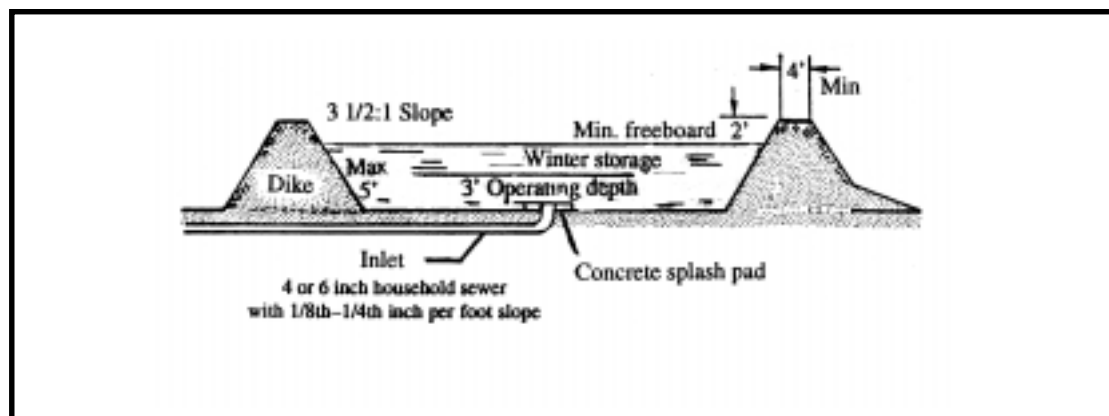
Cross section of wastewater lagoon. A fence at least four feet in height should surround the lagoon. The inlet pipe should have capped cleanouts to allow unplugging the line if needed. *Adapted from an illustration in Onsite Wastewater Treatment and Disposal Systems Design Manual.
